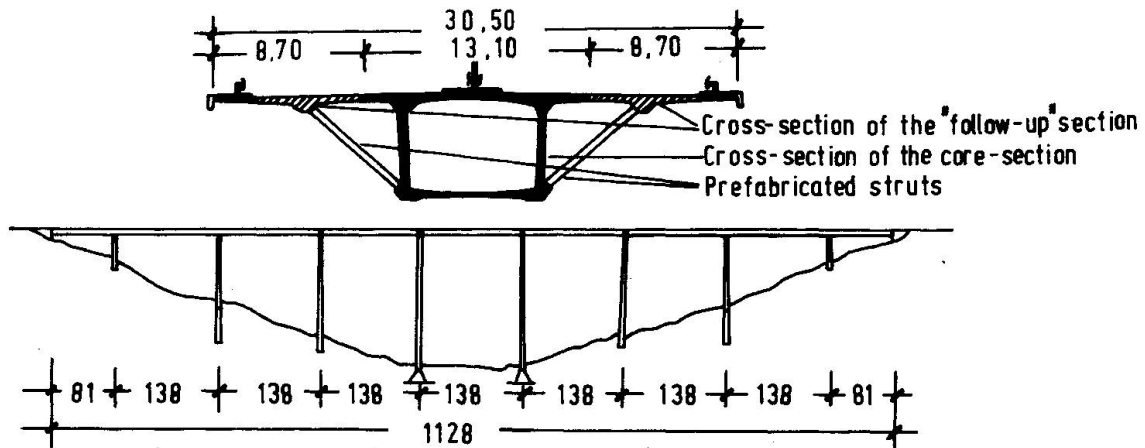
Cross-section and side view of the Kocher Valley Bridge
